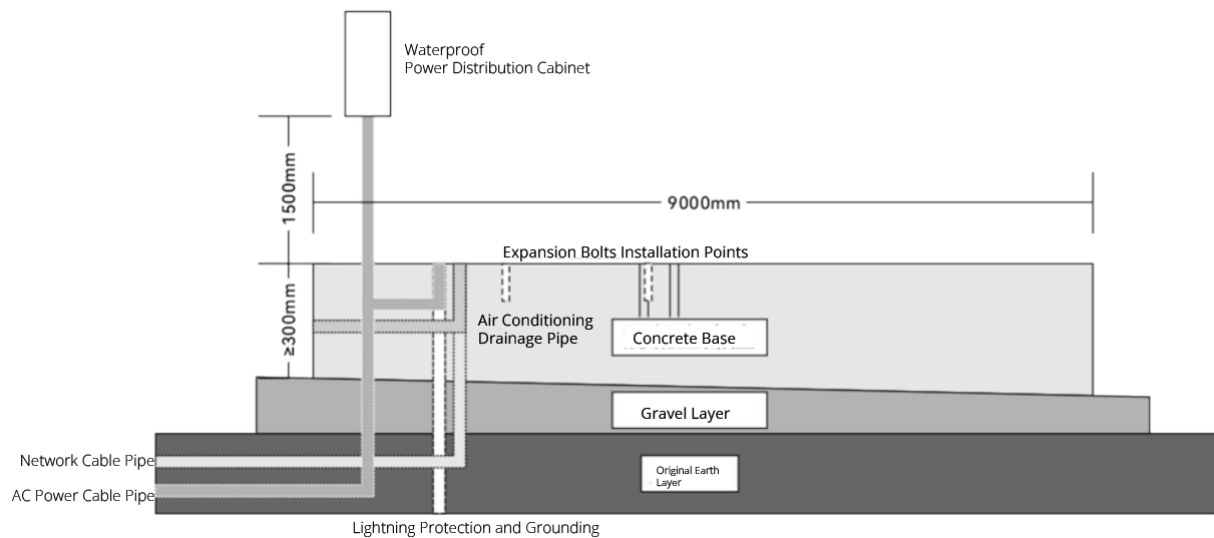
Diagram of Construction on Ground with Hardened Concrete but large slopes or unevenness
